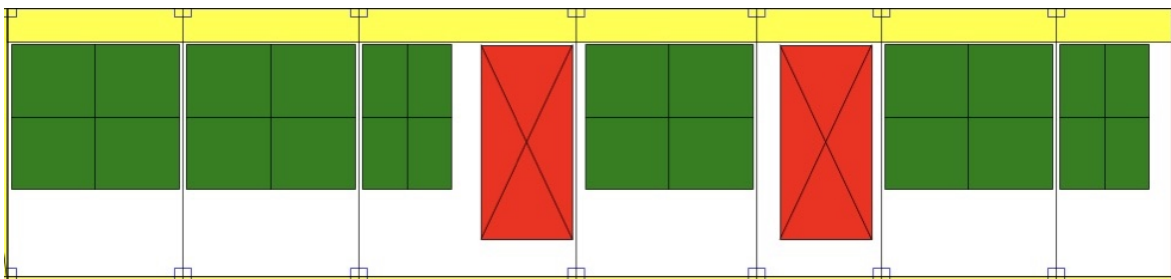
A typical facade section from floor to floor, in this case, with windows and the added prefabricated modules with the registration area in yellow, and the solar panels in green.
